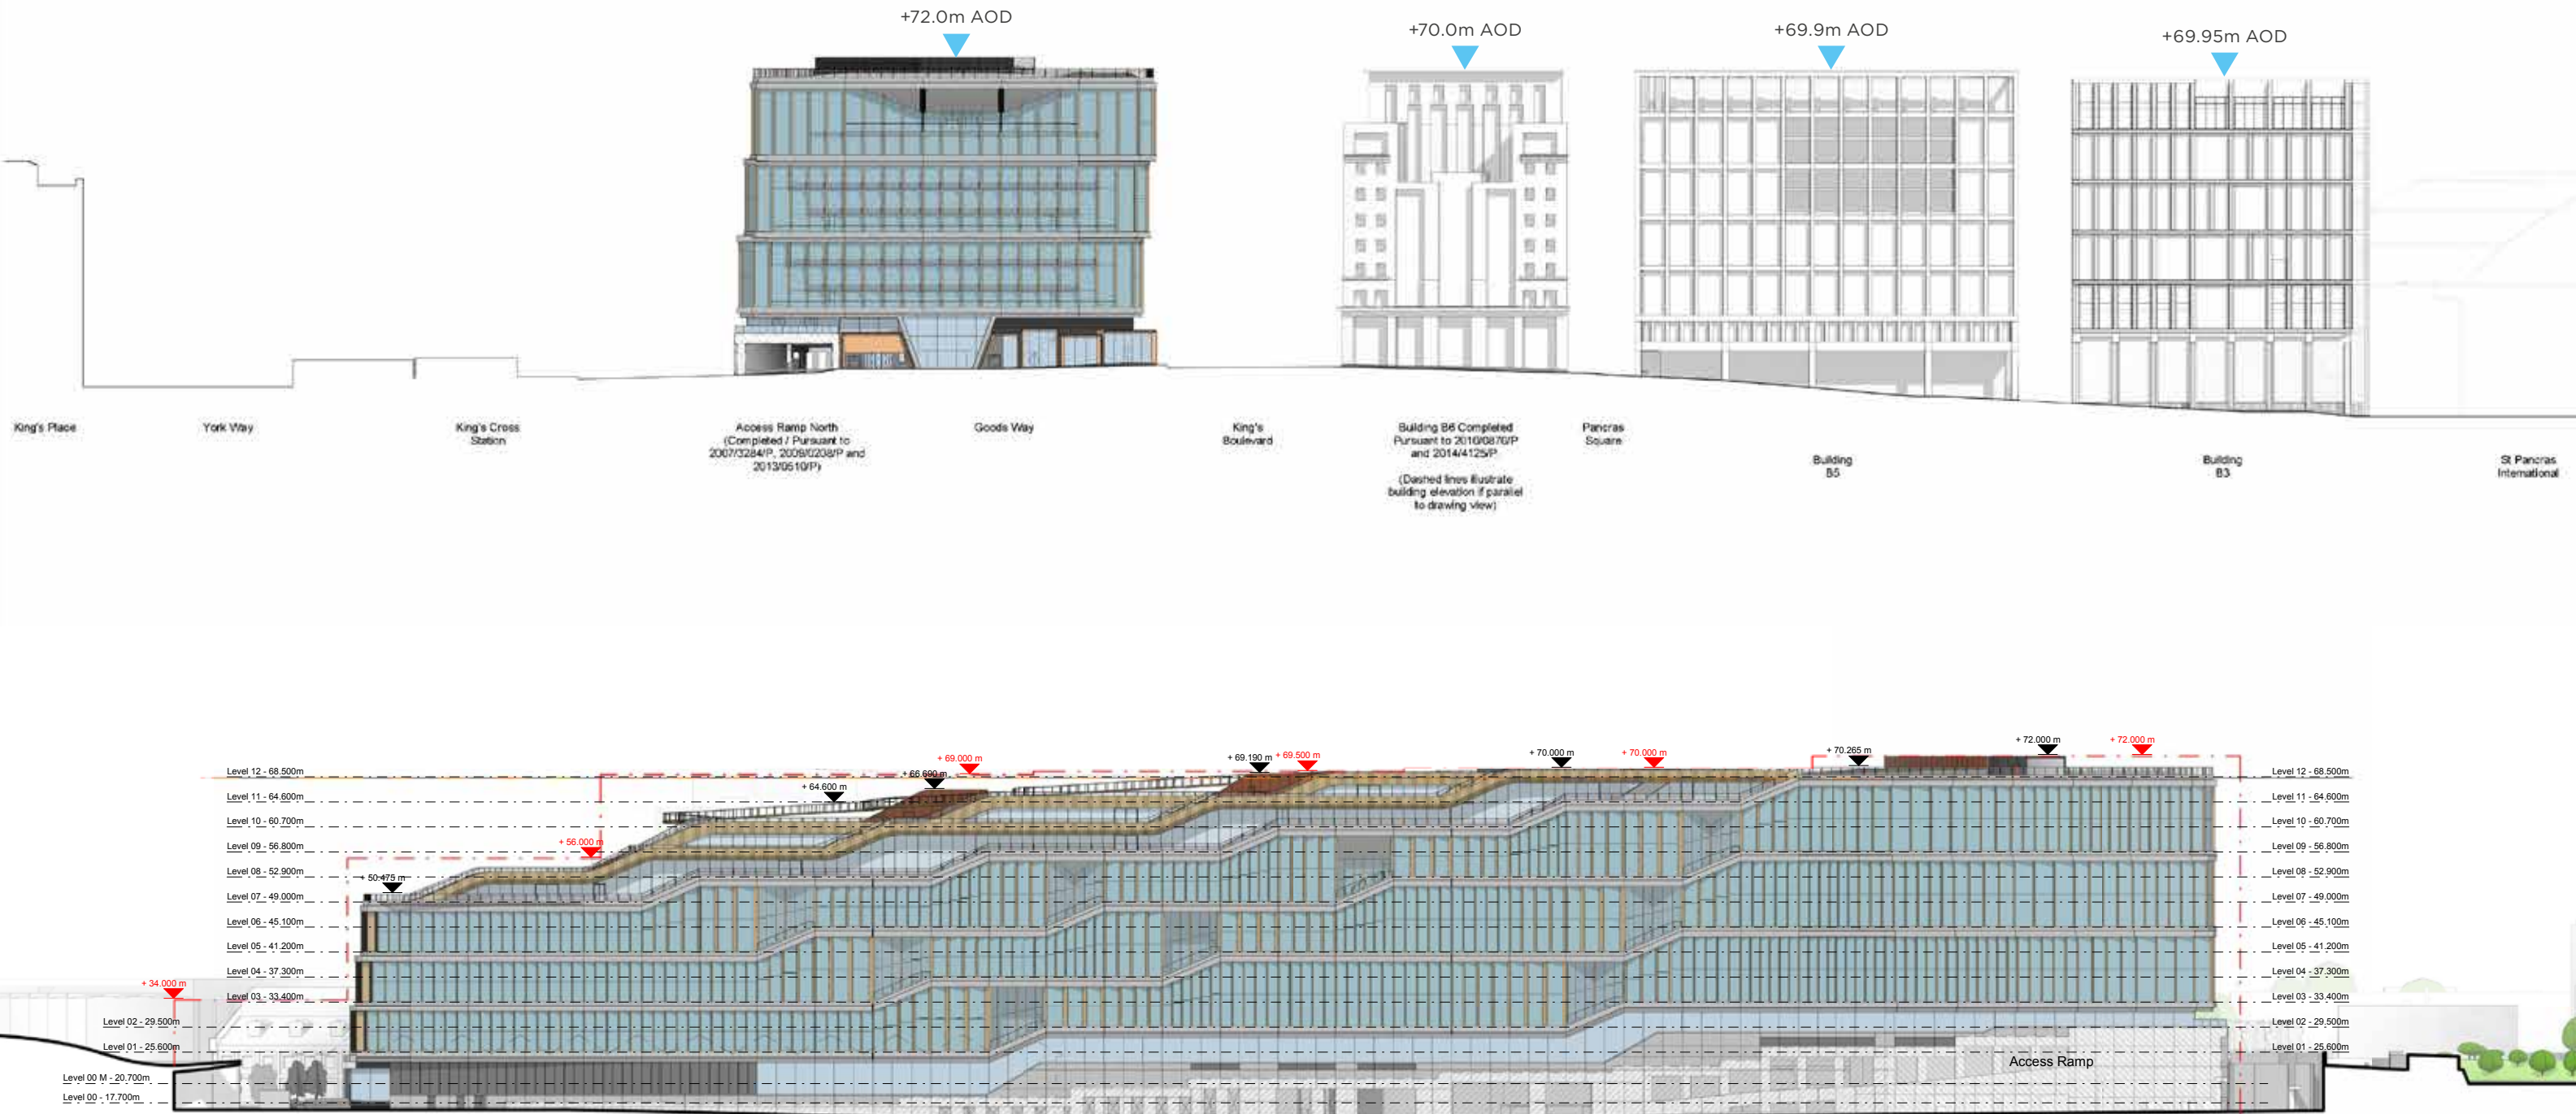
Extract of parameter plan KXC 014 showing the maximum building heights permitted for each plot of Zone A (top) and east elevation showing proposed building heights against maximum permitted heights
